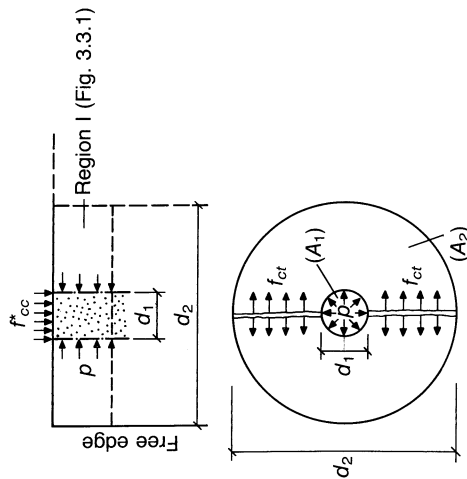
Transverse expansion of concrete near a partially compressed end-face, including transverse cracking (spalling)
